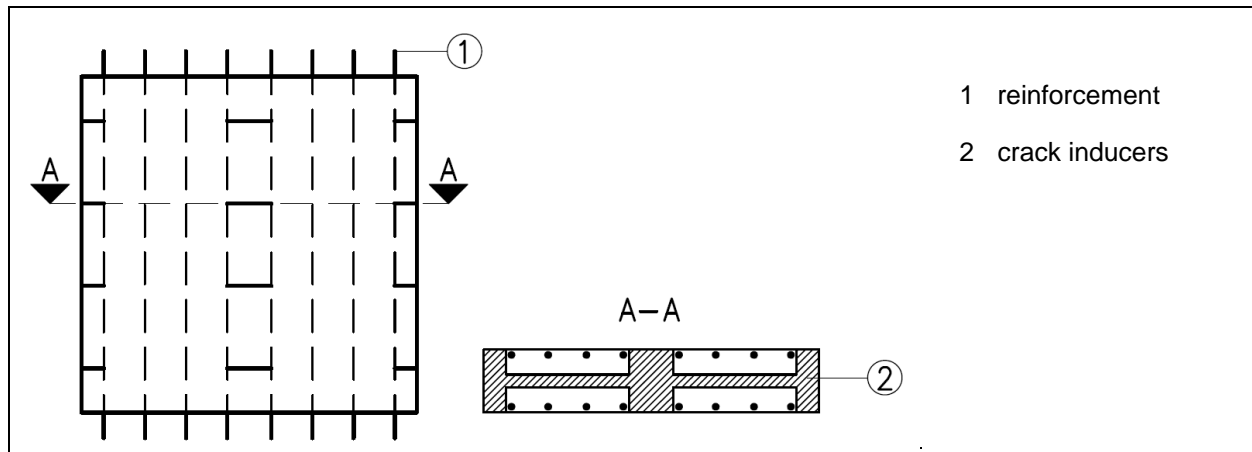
Example of a test member for anchors tested in cracked AAC
